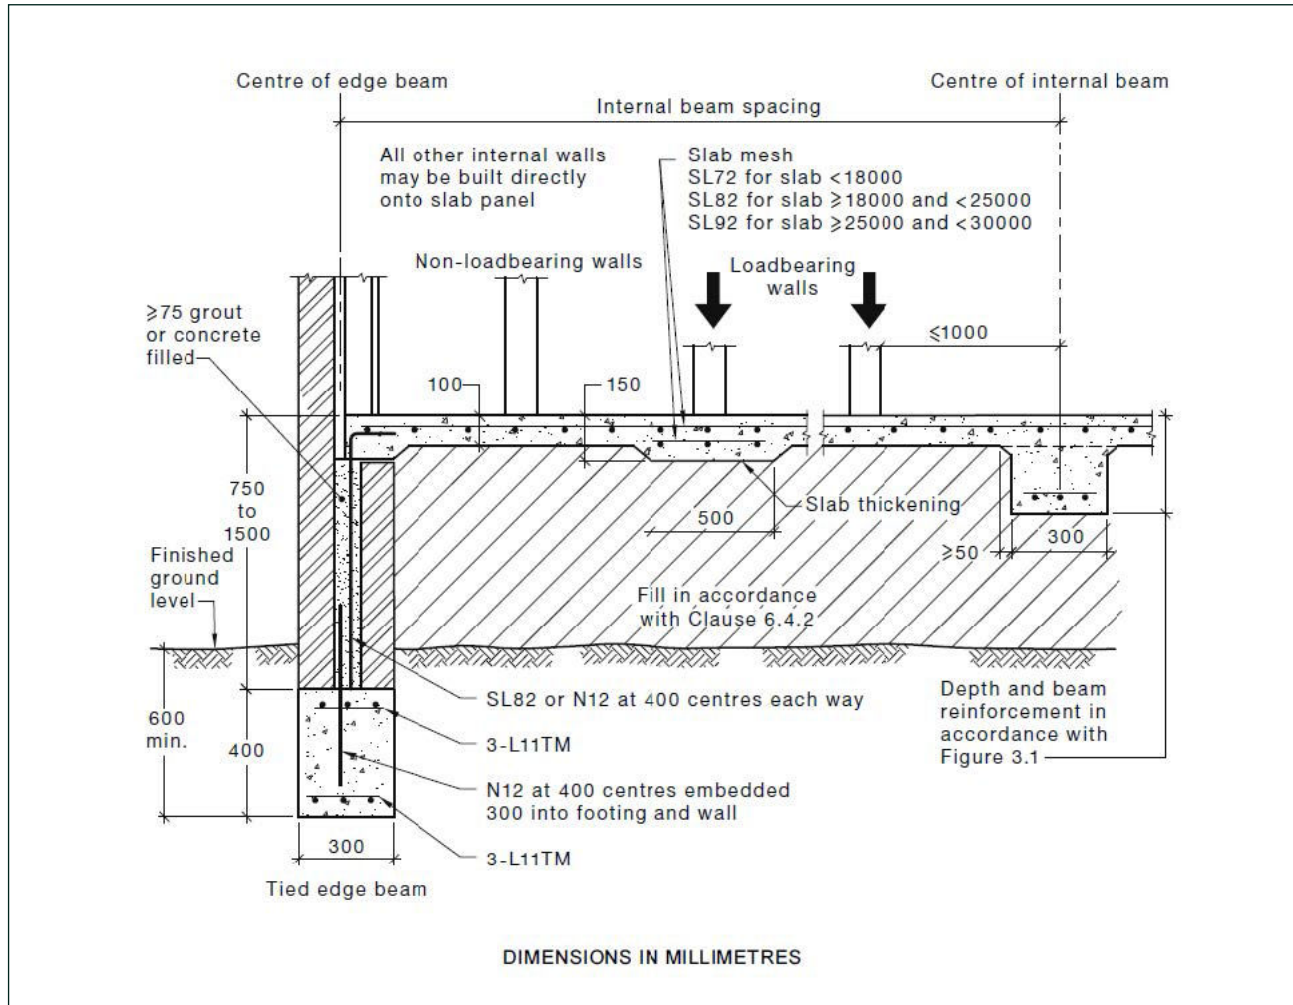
Stiffened slab with deep edge beam for Masonry veneer and articulated masonry veneer with SENSE 600® TrenchMesh™ option - Class M site
